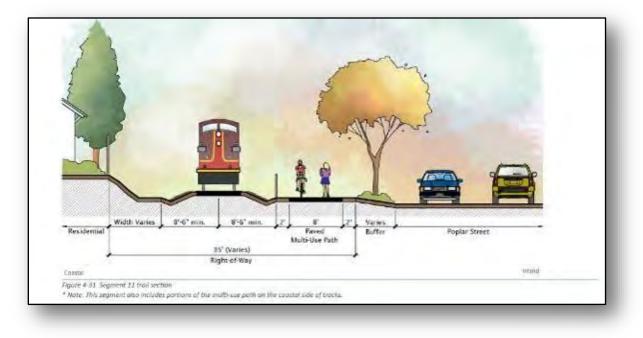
Conceptual Cross Section of the Branch Line Corridor in Segment 11, Obtained from the Monterey Bay Sanctuary Scenic Trail Master Plan
